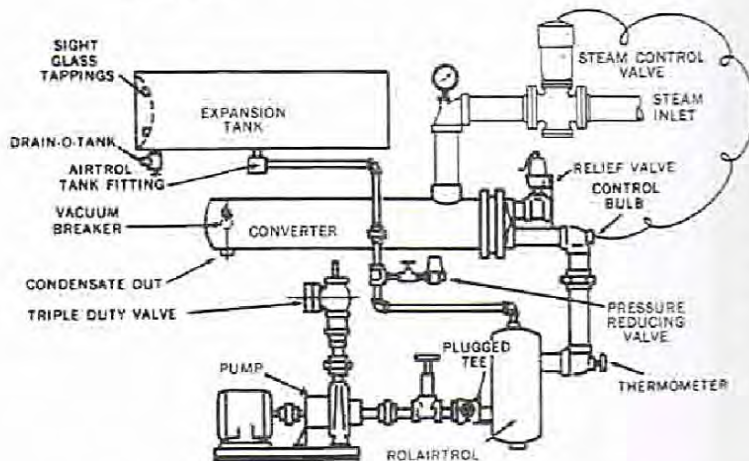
Typical installation of "SUT" Heat Exchanger when used as a Converter.
